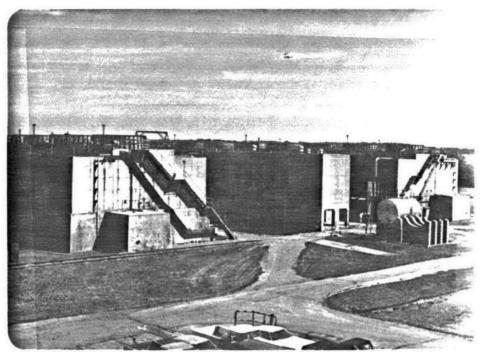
View from the boiler house facing northeast. Cooling towers and the waste water pit are shown.
